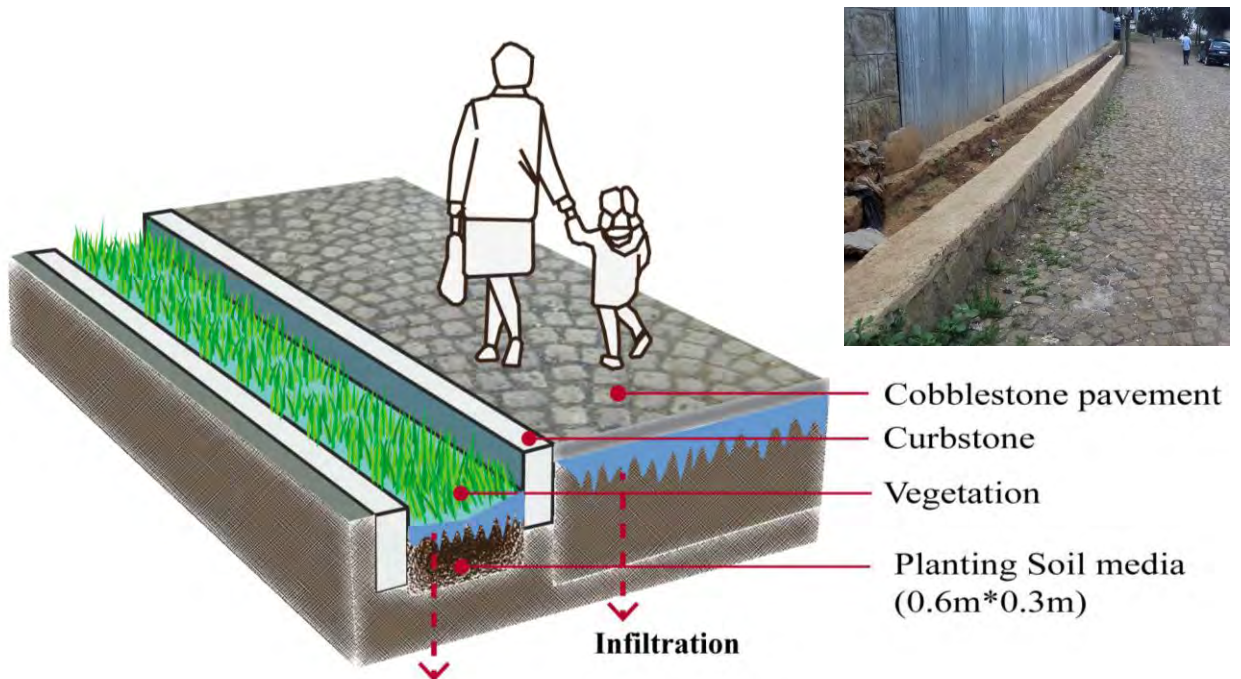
27 Proposed modification on the existing drainage and its curbstone
